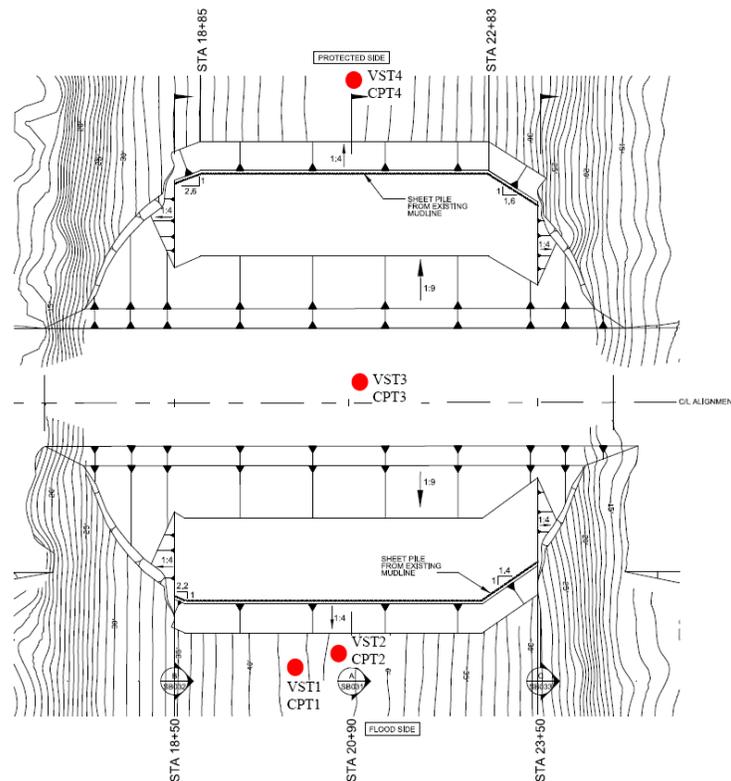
Plane view of MRGO berm and lay-out of additional field testings
